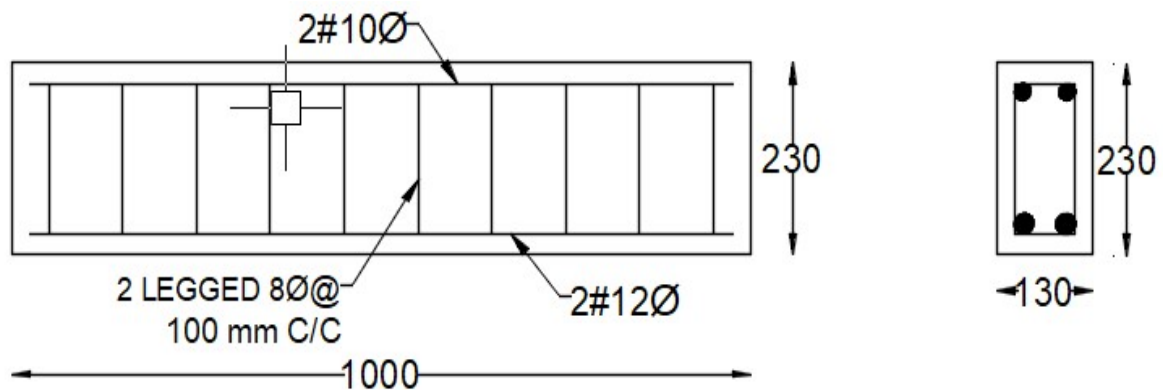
Longitudinal and cross sectional view of concrete beam
